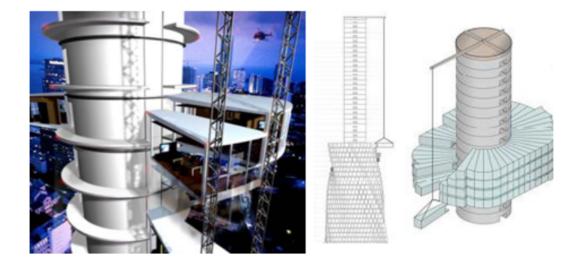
Hooked Pre-assembled Units and Construction Method of Dynamic Tower
